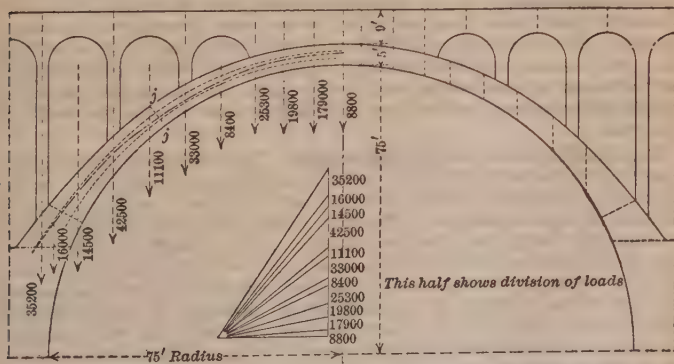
Connecticut Ave. Arch, Washington, D. C.
